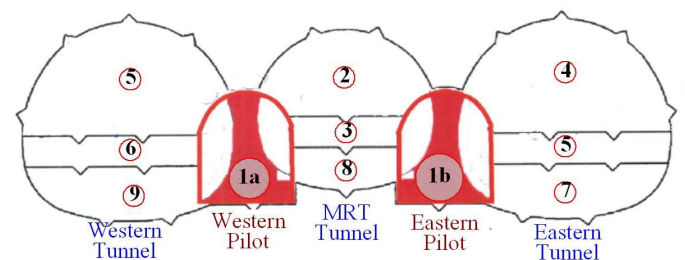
Cross-section configuration with multi-arch of tunnel and tunnel excavation sequence.
